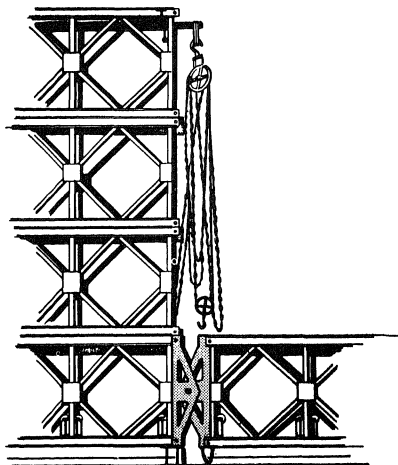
Panel tower and lift span connected and pinned for bridge traffic.
